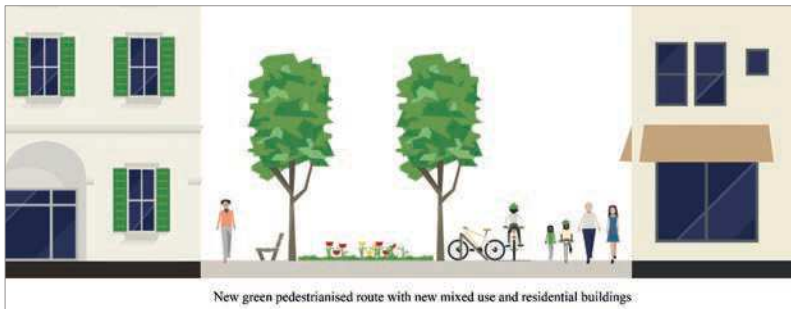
New Walk Pedestrianised Route (replacing White Hart Street) © Street Mix
